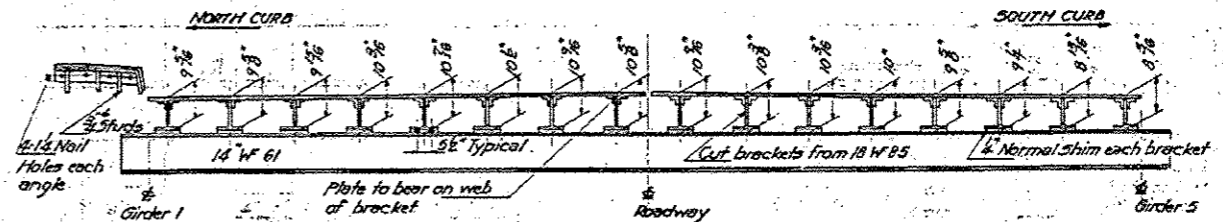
DETAIL OF FIXED BEARING AT PIERS 1, 4 & 8
